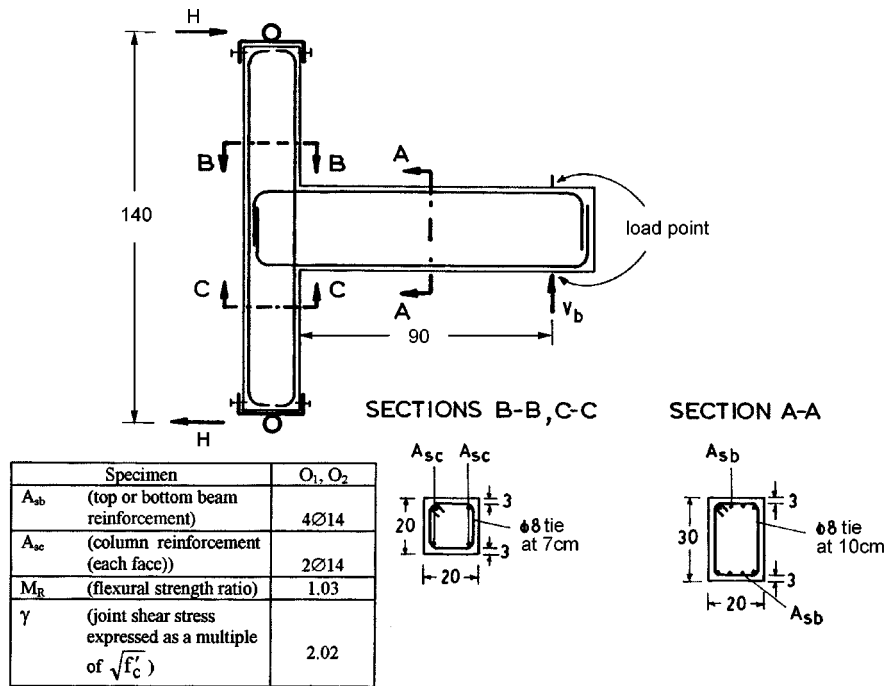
Dimensions and cross-sectional details of original specimens O_1 and O_2 (dimensions in cm)
